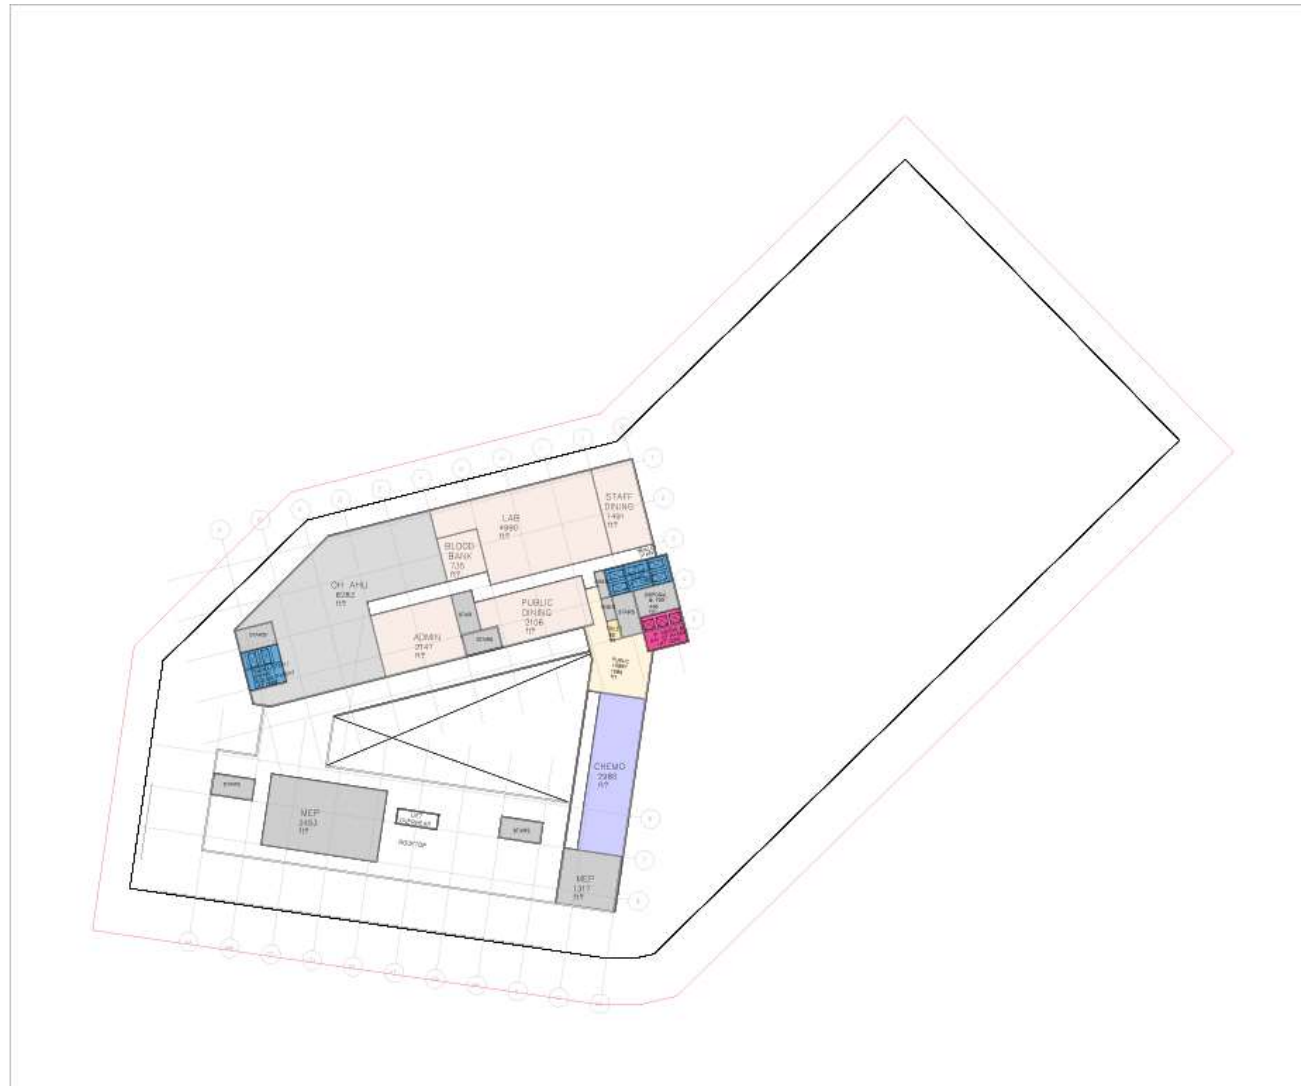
Fifth Floor Plan of Novacare Hospital Project
